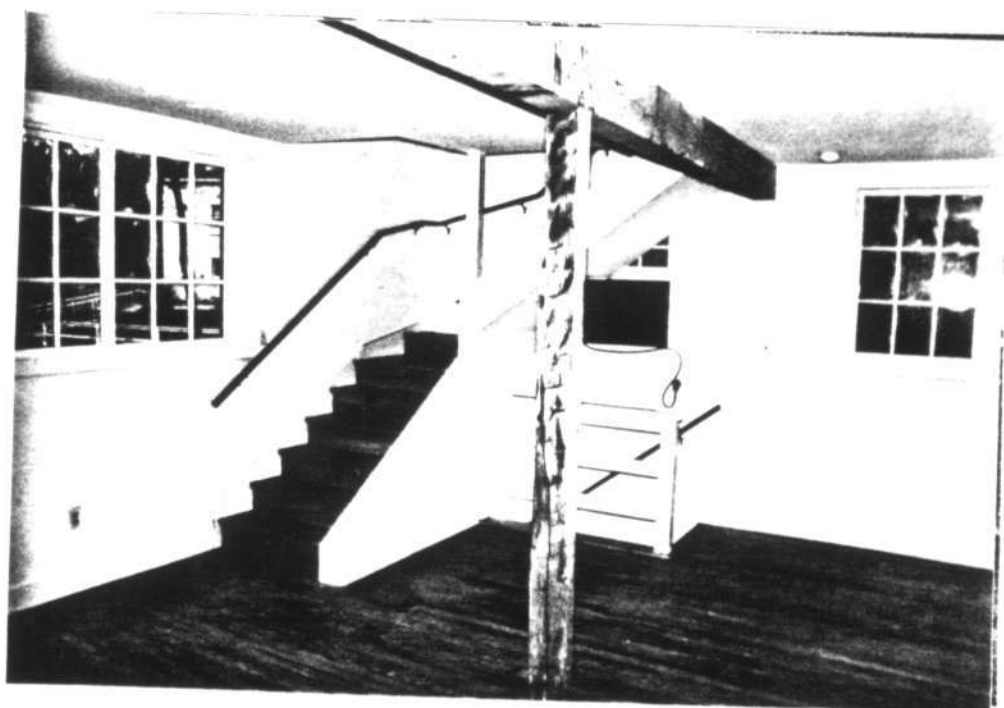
First floor carriage house after rehab. Floors retained and refinished. Walls and ceiling covered with drywall. New center beam required to sustain load on top floor. Carriage doors and double-hung windows across front restored.
